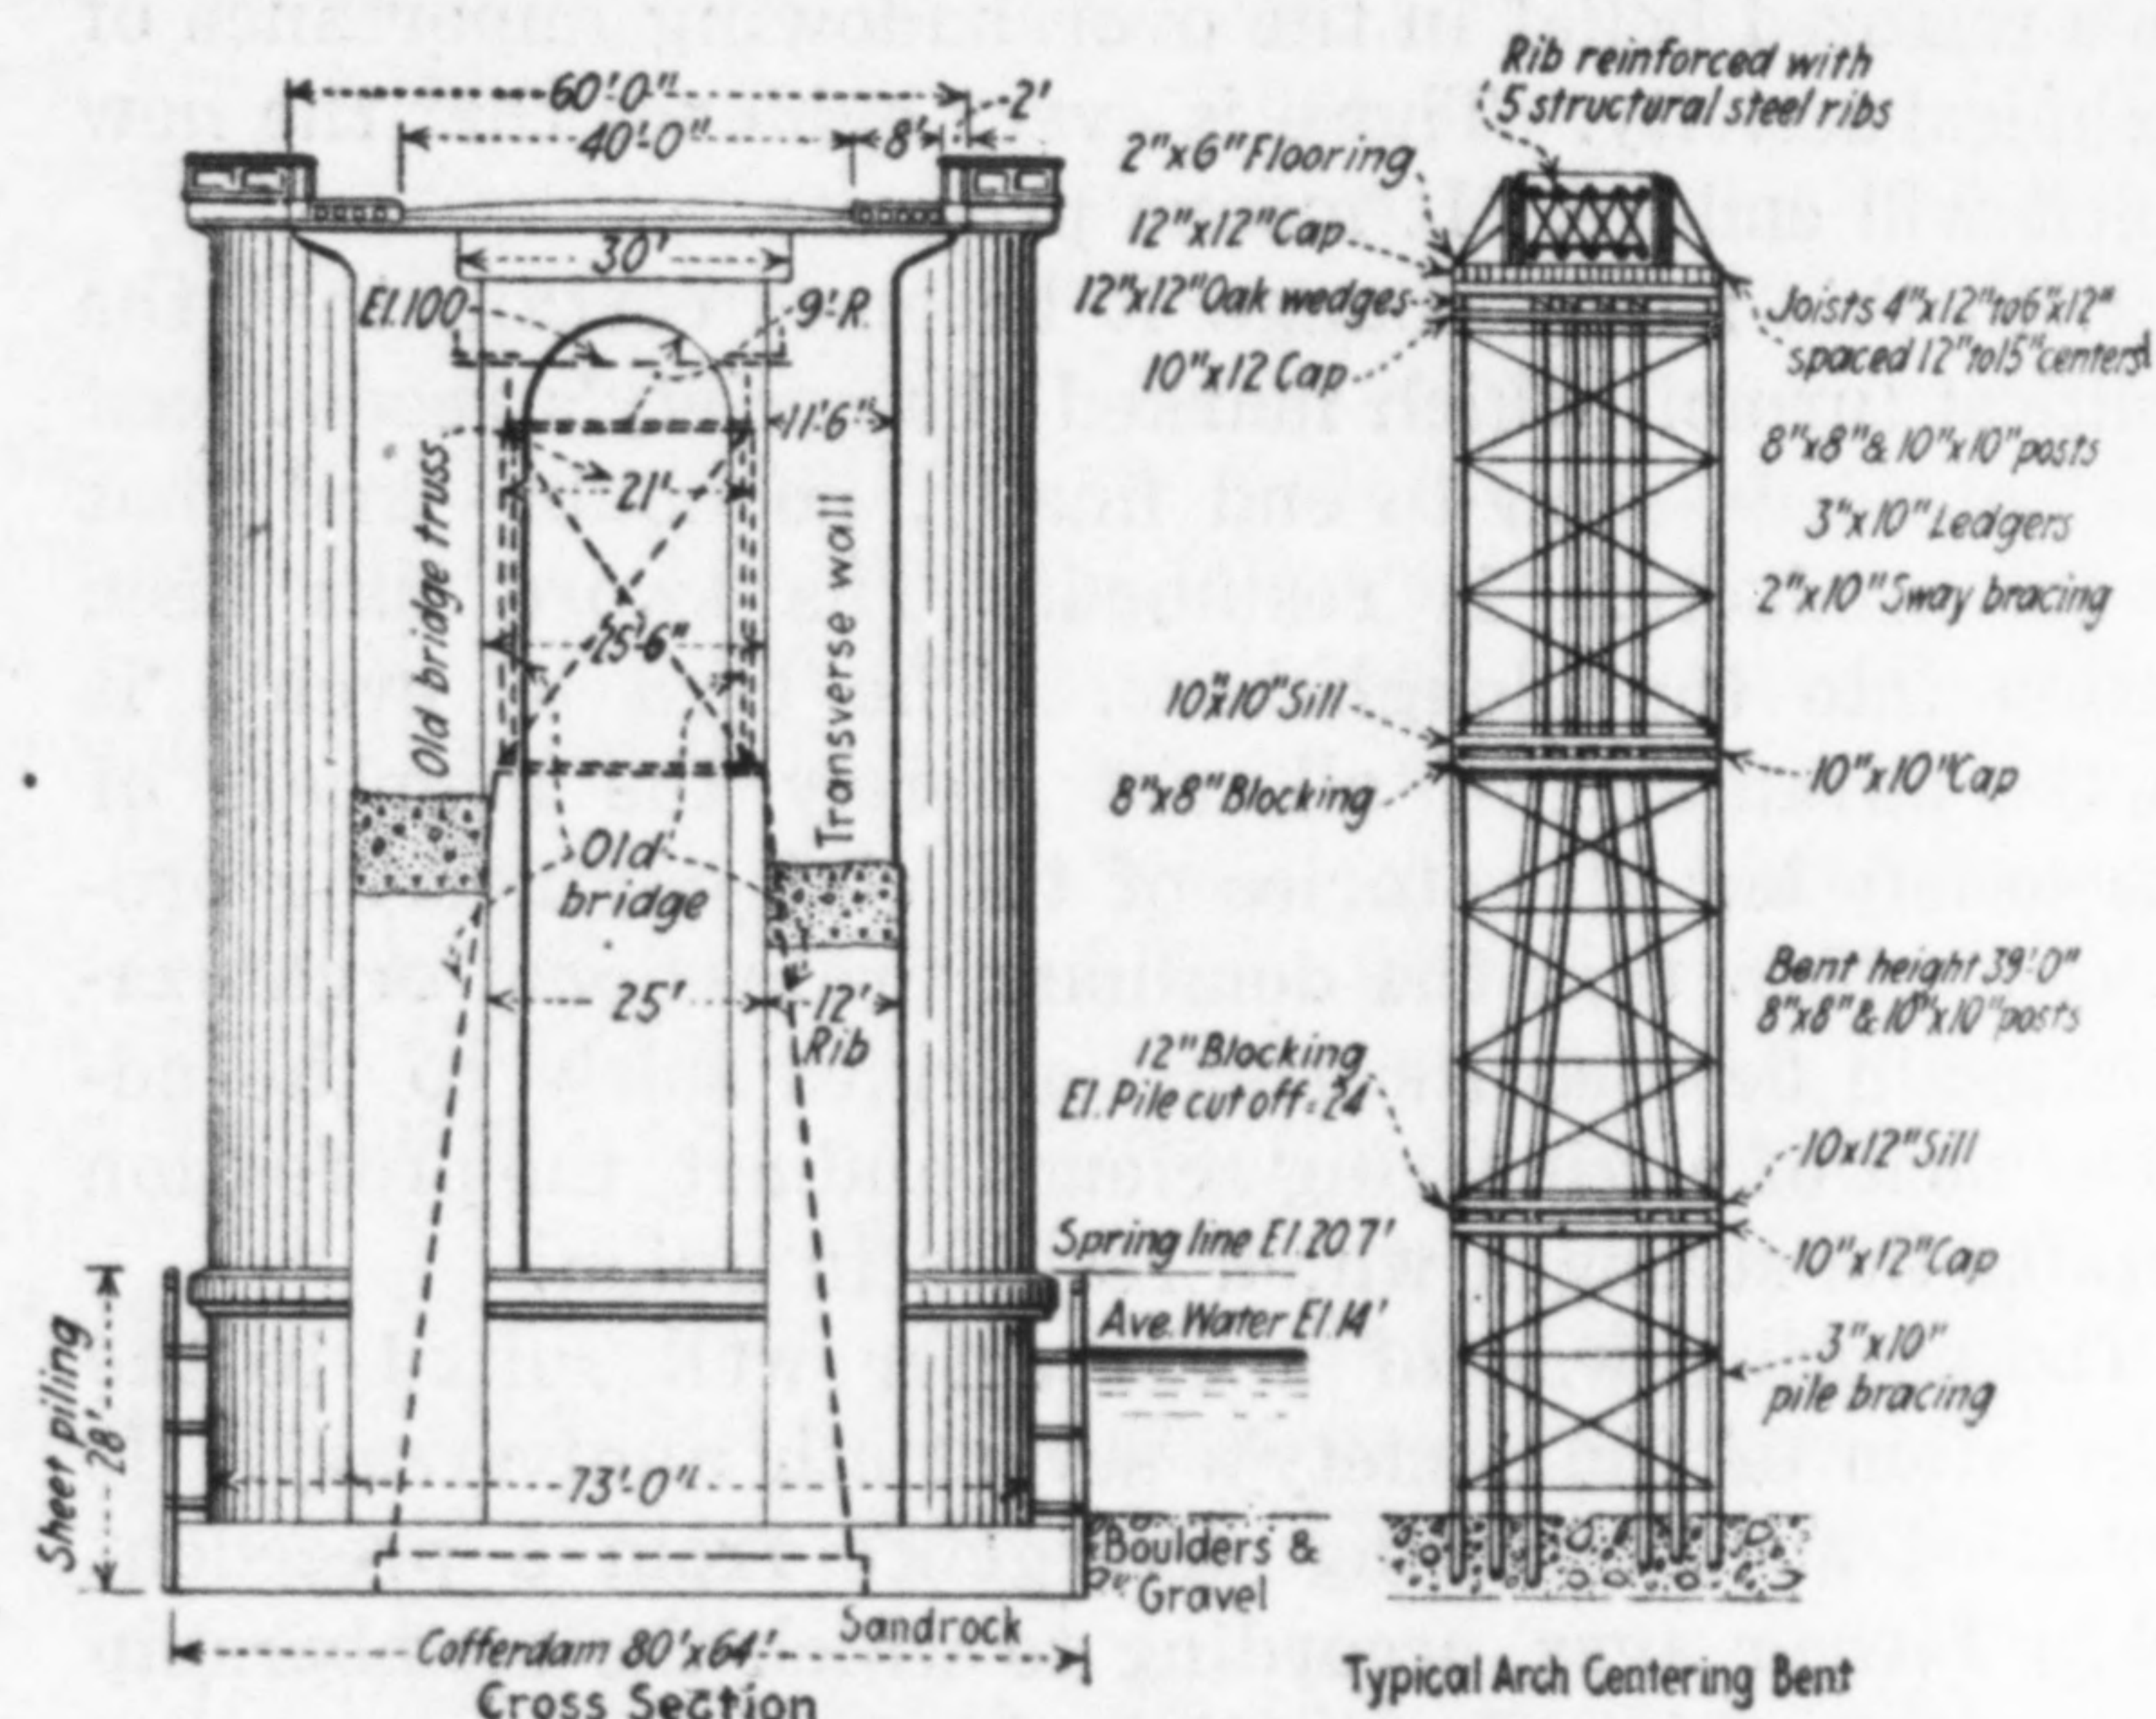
FRANKLIN AVE. CONCRETE ARCH BRIDGE—THREE-STORY CENTERING FOR MAIN ARCH RIB
